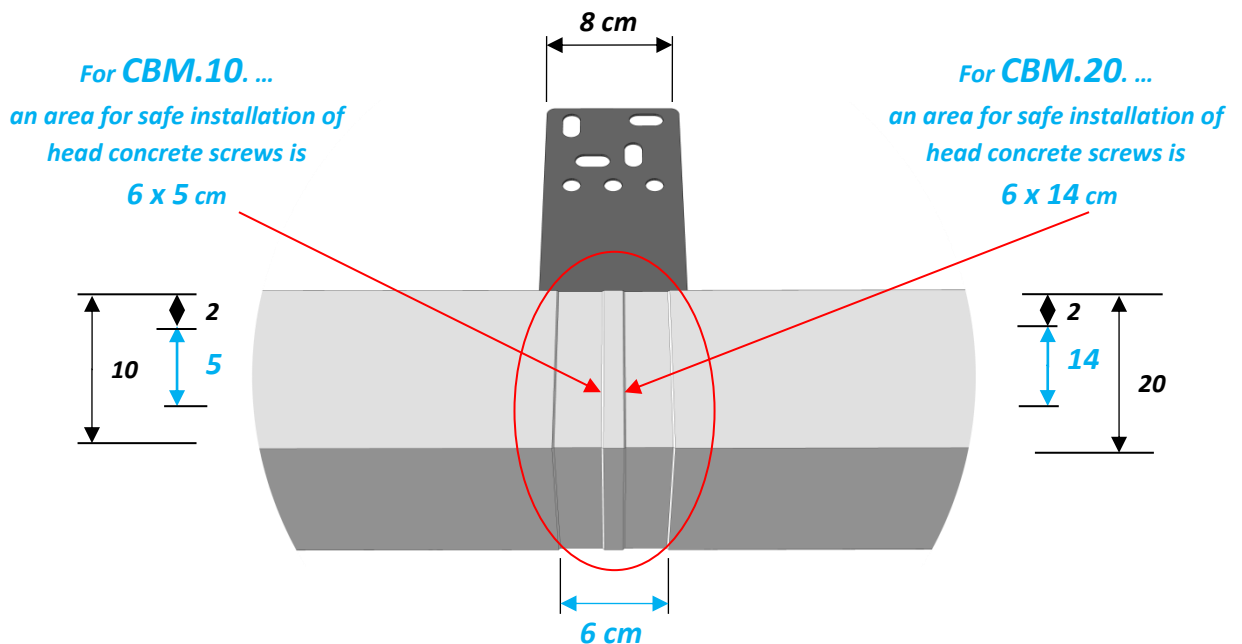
Area for safe installation of head concrete screws in steel brackets "encased" in CBM beams
